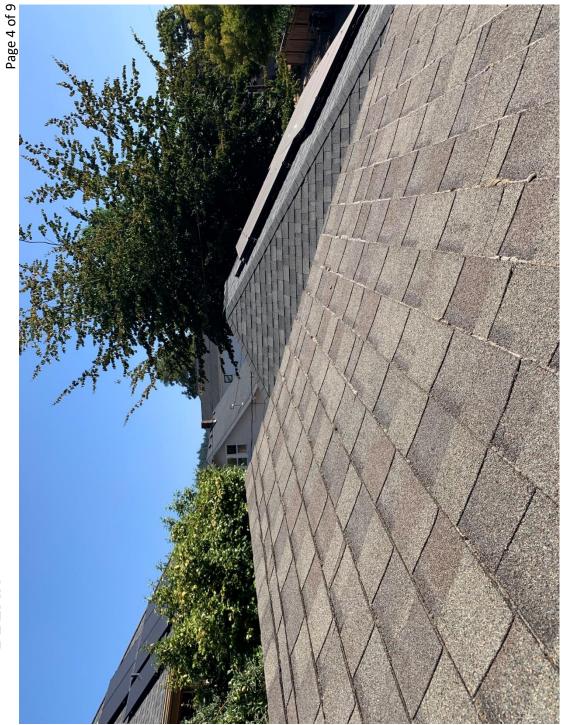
View of neighboring solar installation on the rear roof of the neighboring detached garage accessory structure
